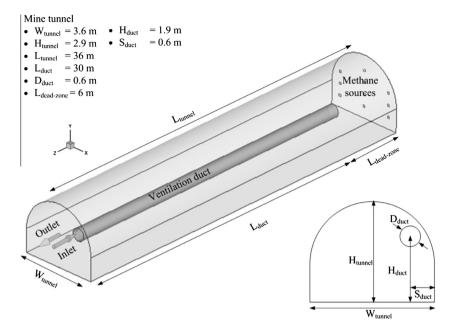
Shcematic of an underground mine tunnel with ventilation duct.
